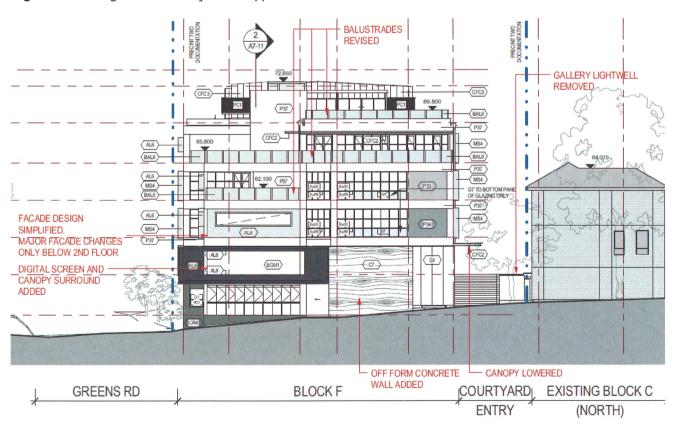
Building F northern façade as proposed to be modified. Major changes noted in red.
